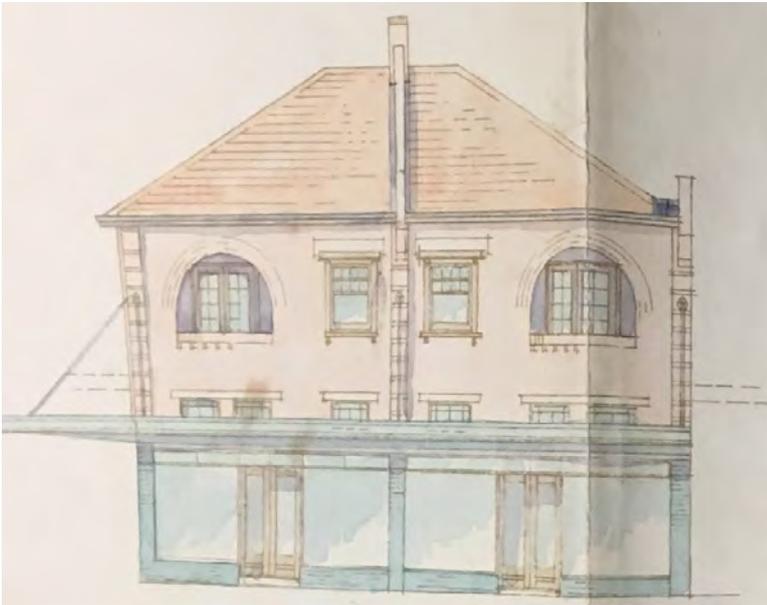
Original drawing, front/east elevation (Source: Council Building File)
